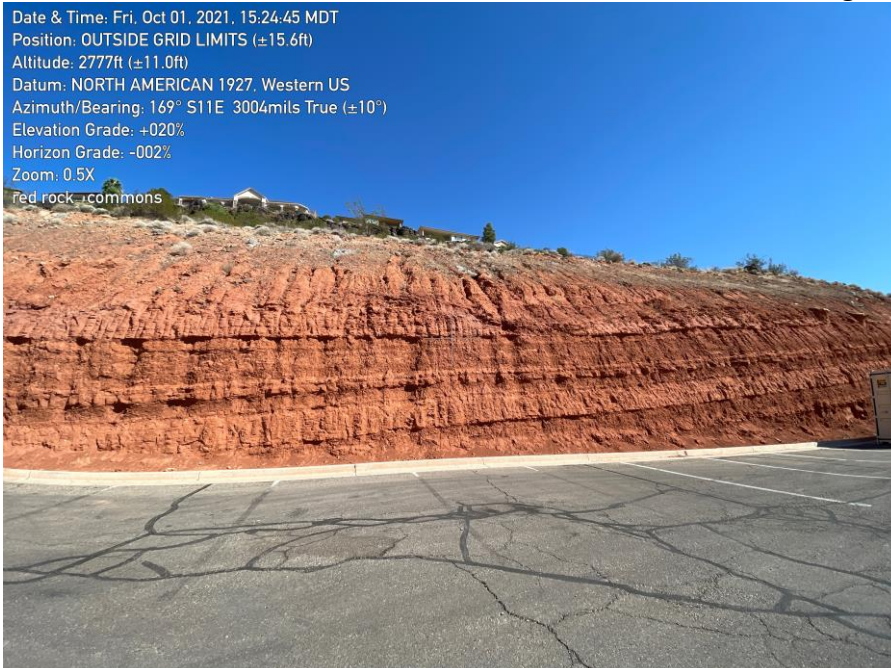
View of cut face in shale bedrock – Red Rock Commons
